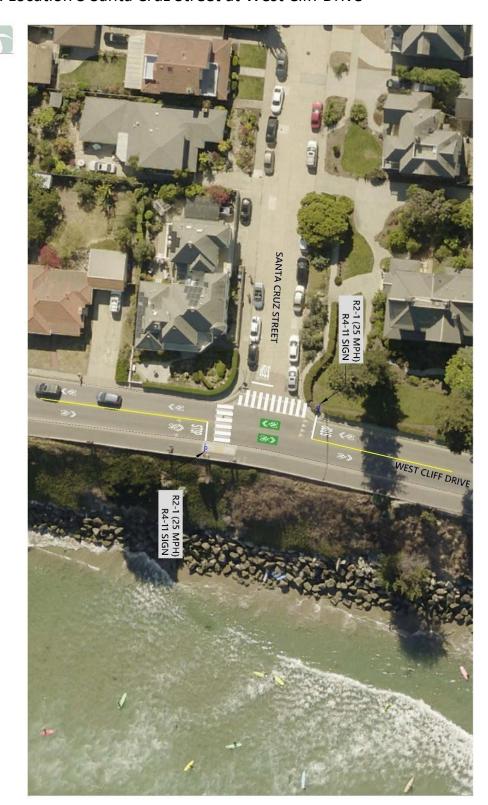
Plan view of Alternative 1 Enhancements at Santa Cruz St and West Cliff Drive
